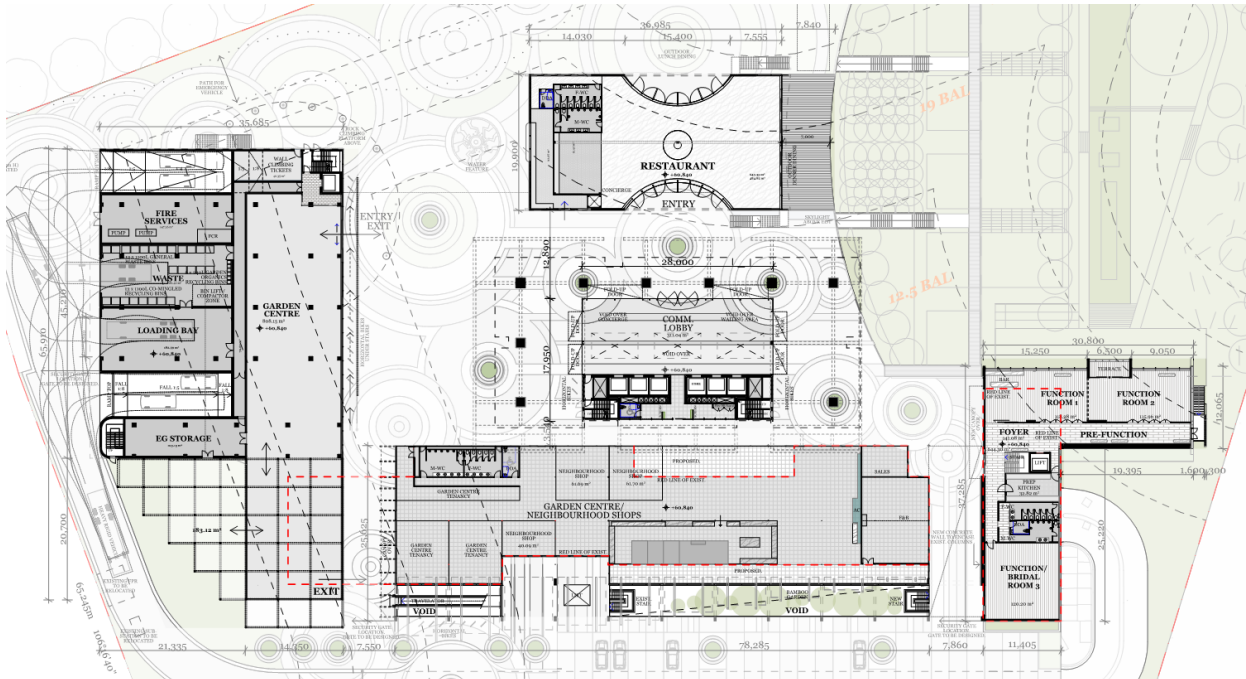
Extract of the proposed ground floor plan (Source: DKO)
